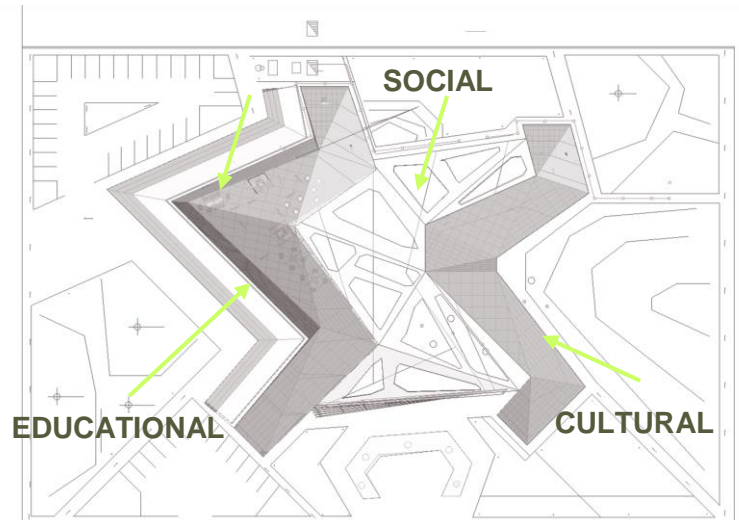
SITE PLAN (DEVELOPMENT STAGE)
